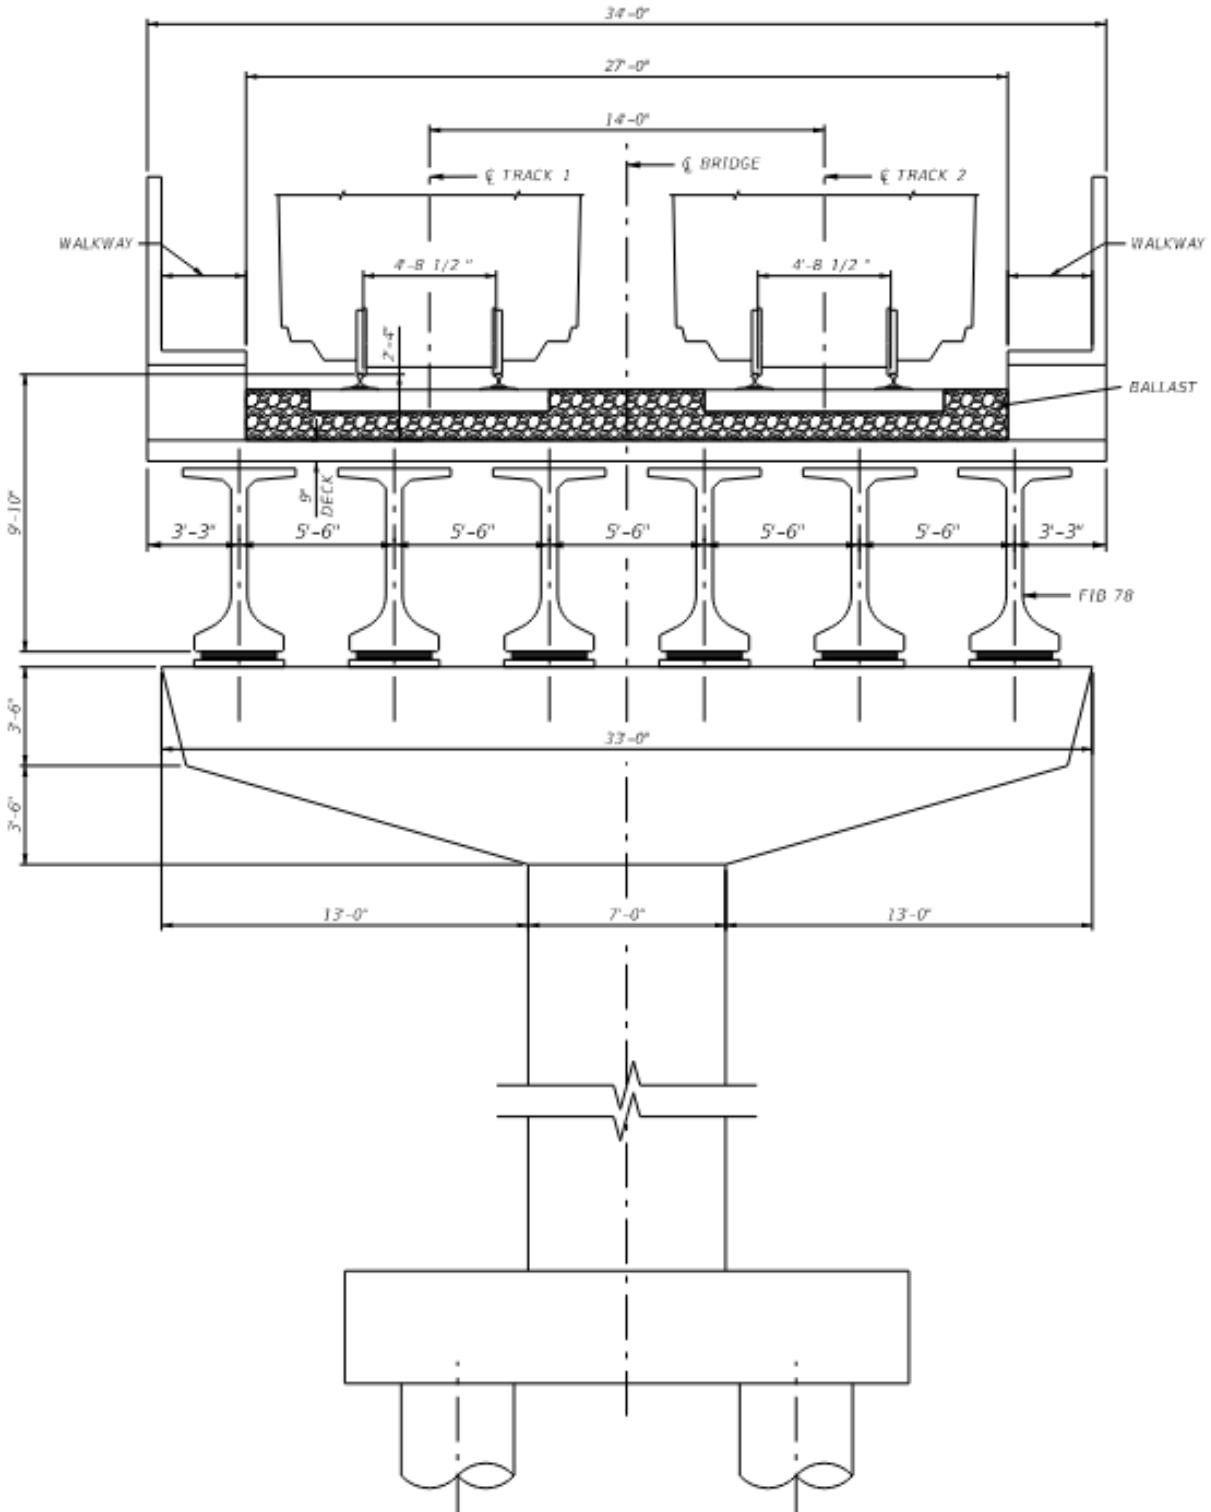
Guideway North & South Approaches FIB 78 – 119'-3" FT Spans
